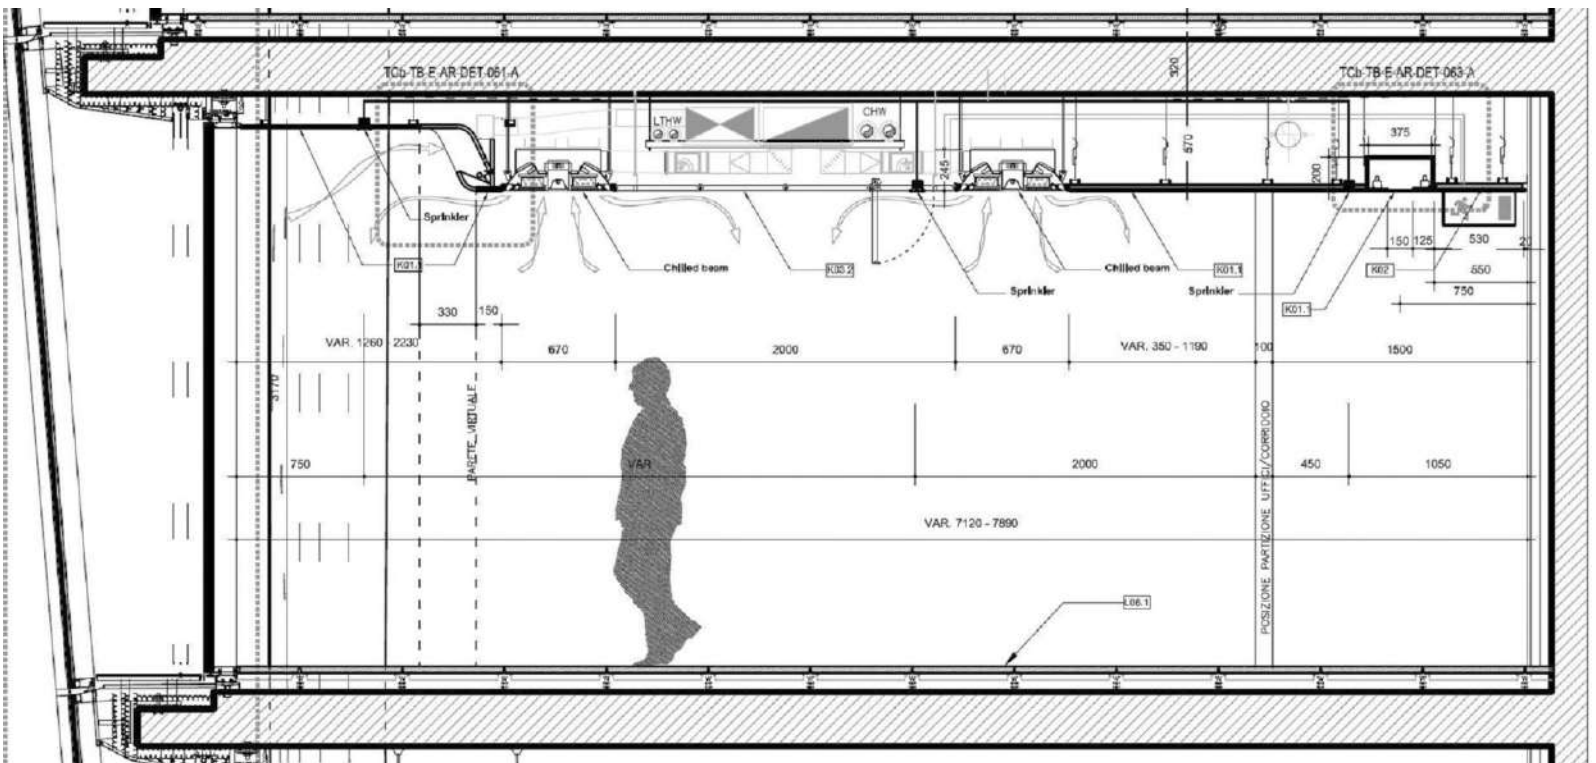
Hadid Tower in Milan, example of a cold-beam system in a typical section (credit: CityLife, 2018).
